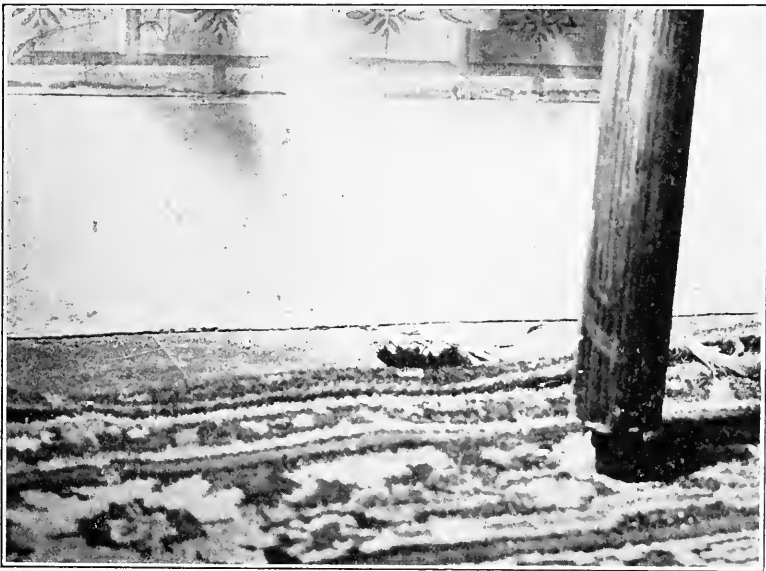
Floor damaged by the furniture beetle, and hole where one leg of the bed broke through it.
